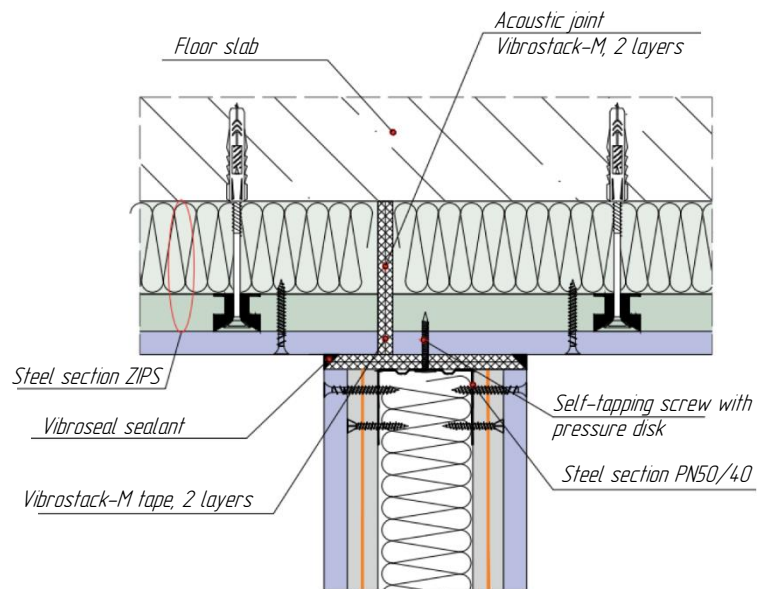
Connection of single-frame soundproofing partition to ZIPS panel system on a floor slab.
